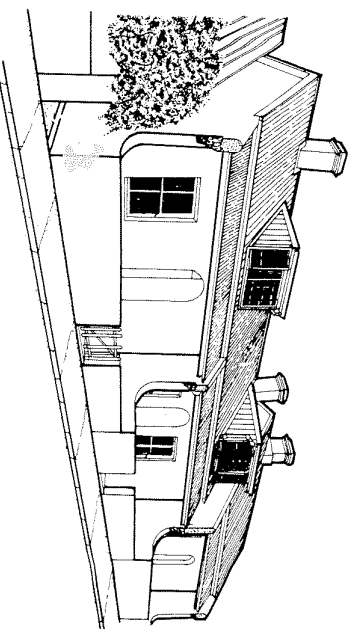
Unsympathetically-shaped addition of roof dormers. Triangular-shaped dormers would have been better
